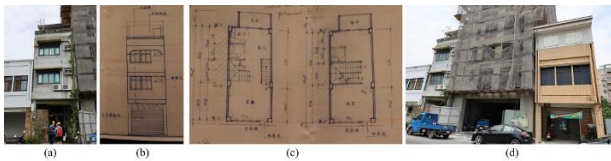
(a) street view, (b) elevation view, and (c) plan view of Building C04; (d) the adjacent eight-storey building.
